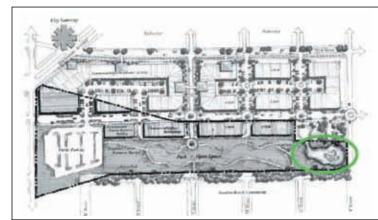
STORMWATER RETENTION POND LOCATION
